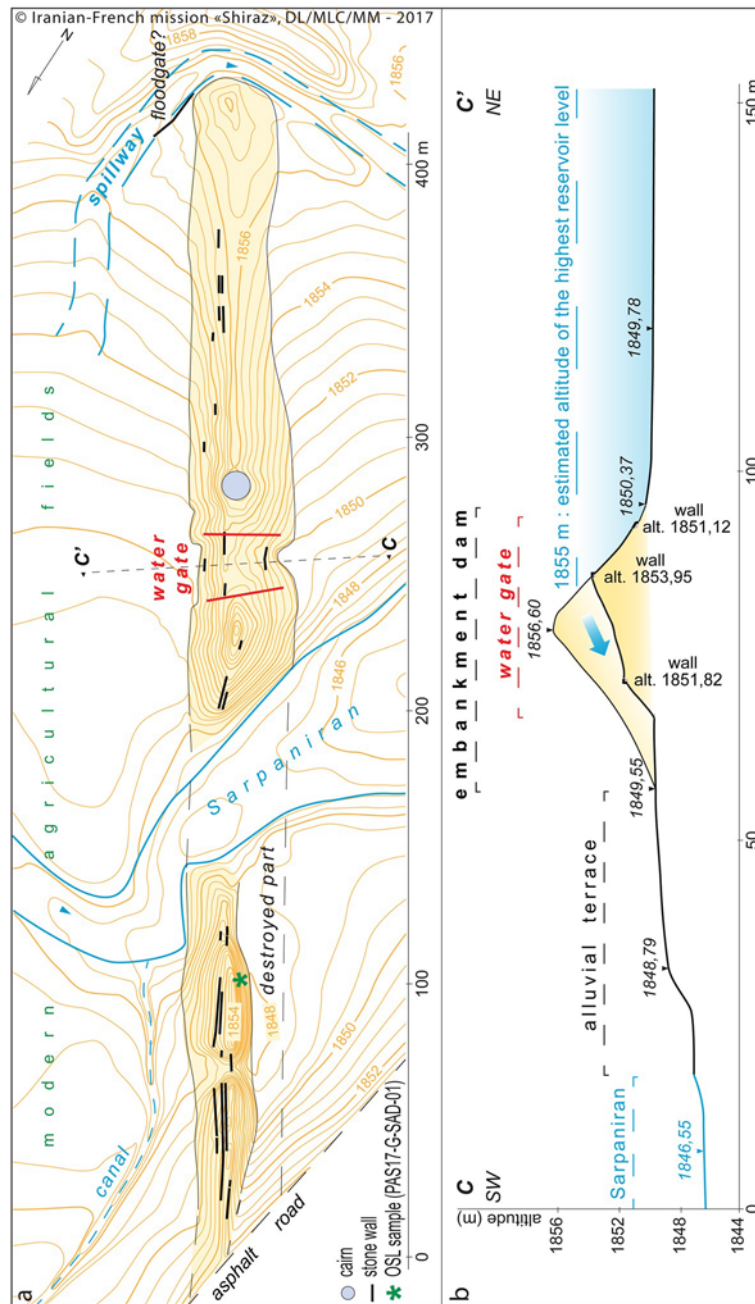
Plan a and profile b of the dam of Sa'adatshahr
